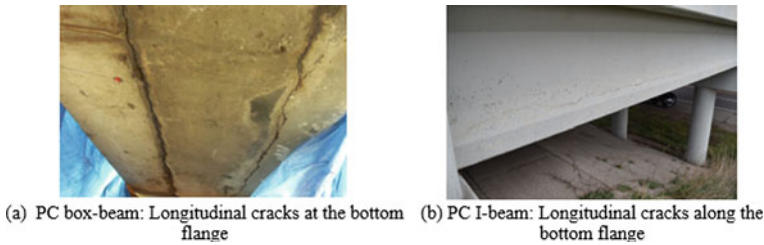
Typical crack types observed in prestressed concrete beams
